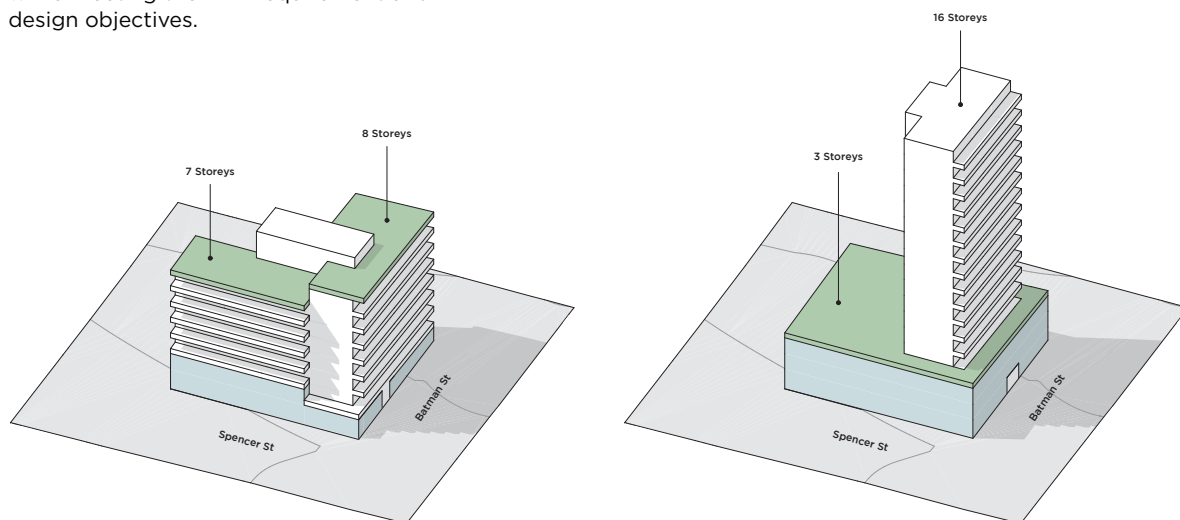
Built form testing to show the proposed floor area ratio and built form controls on a corner site in Flagstaff (DDO33). Images are indicative only to test the proposed controls and are not representative of actual building proposals (West Melbourne Built Form Testing, Breathe Architecture).
